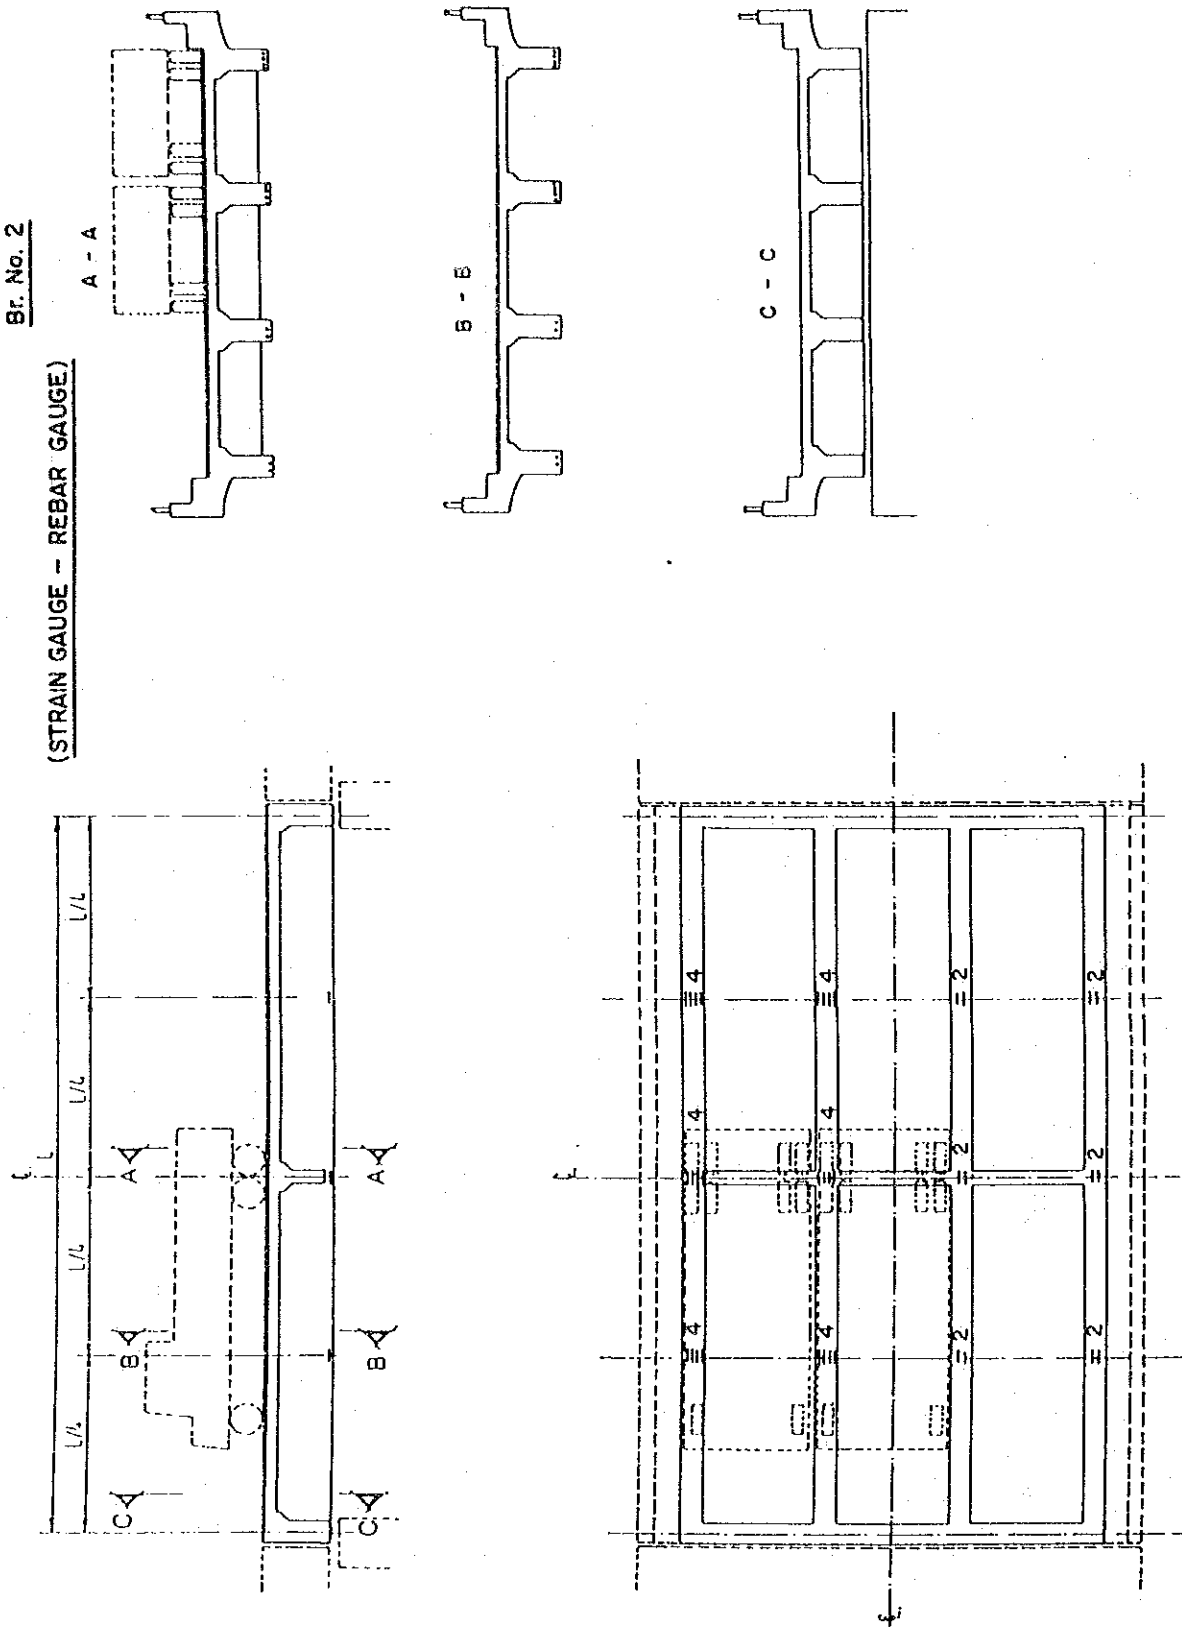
Setting Position of Measurement Equipment (Br.No.2)
